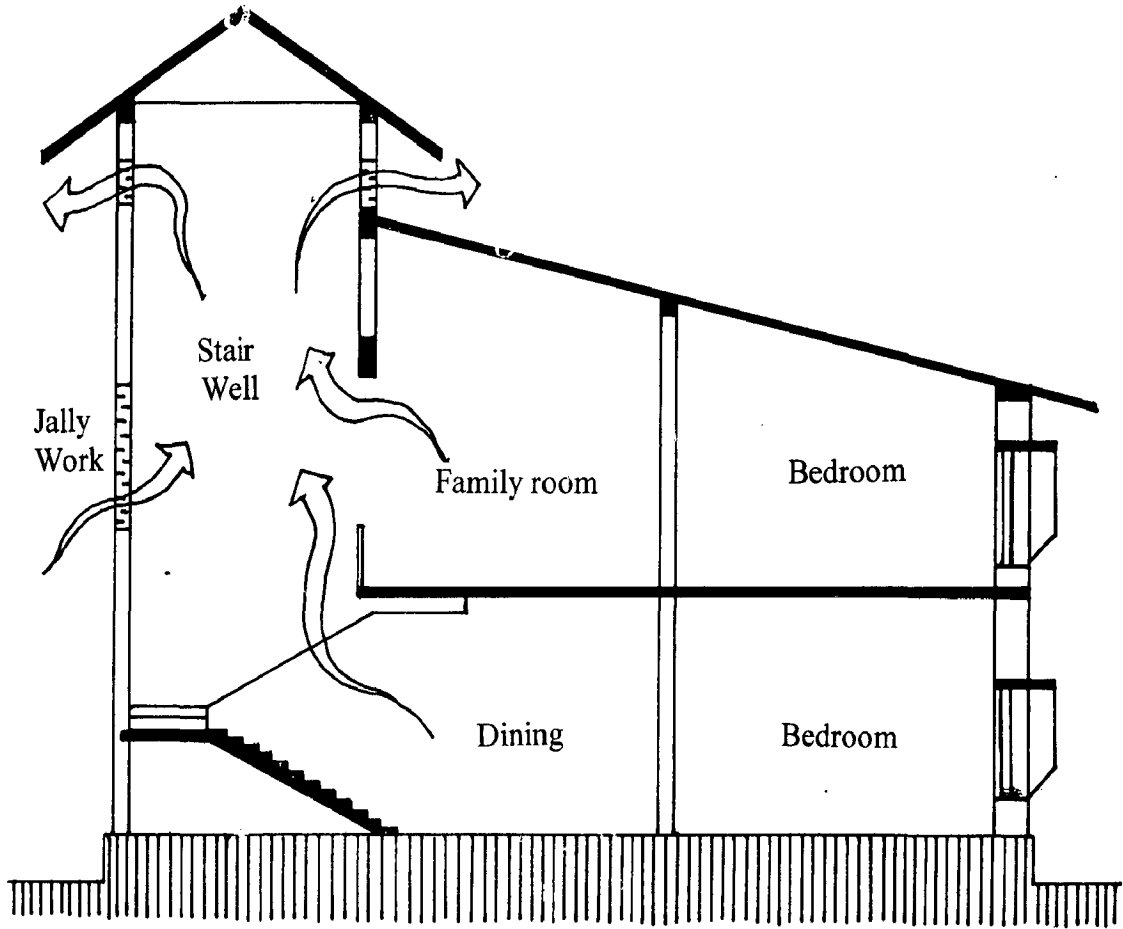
Section through Stair-well: Antony's House, Scale 1:100
